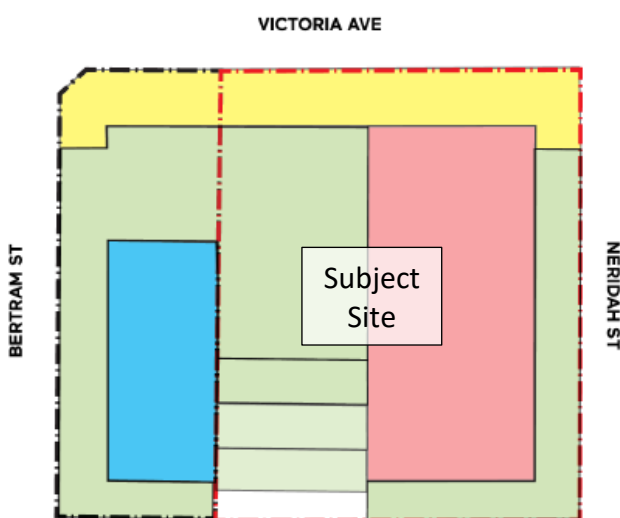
Site plan of block bounded by Bertram Street and Neridah Street and Victoria Avenue (source: APlus Design Group)
